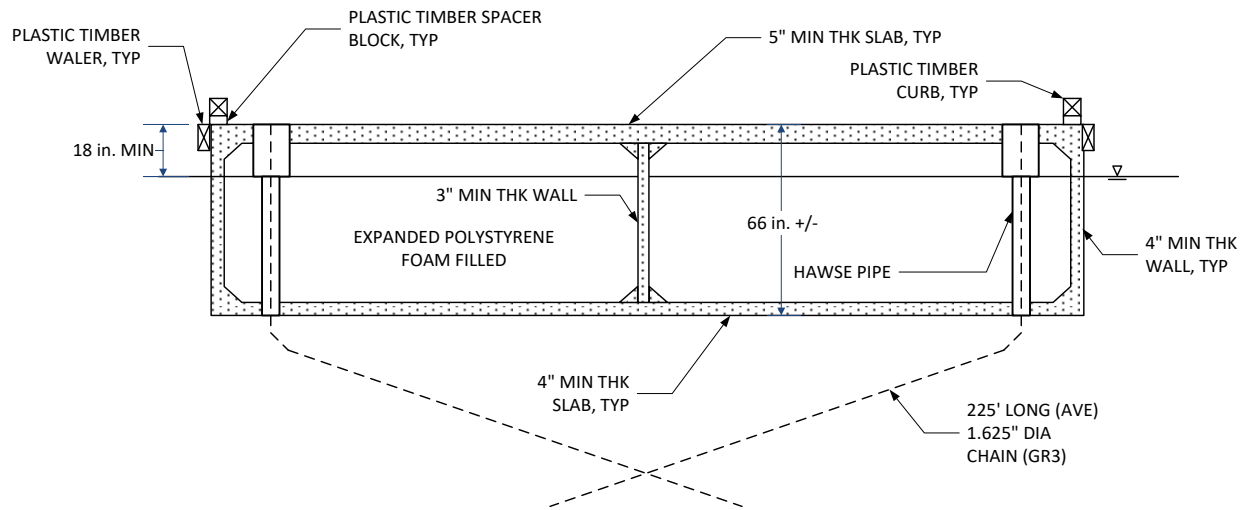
Typical Cable Moored Float Cross-Section for 25' and 20' Wide Floats
